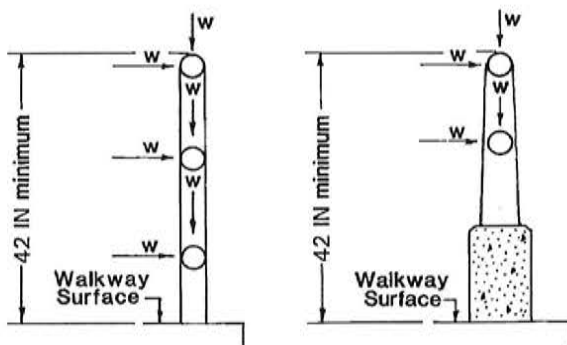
Pedestrian Railing Loads—To be used on the outer edge of a sidewalk when highway traffic is separated from pedestrian traffic by a traffic railing. Railing shape illustrative only.
